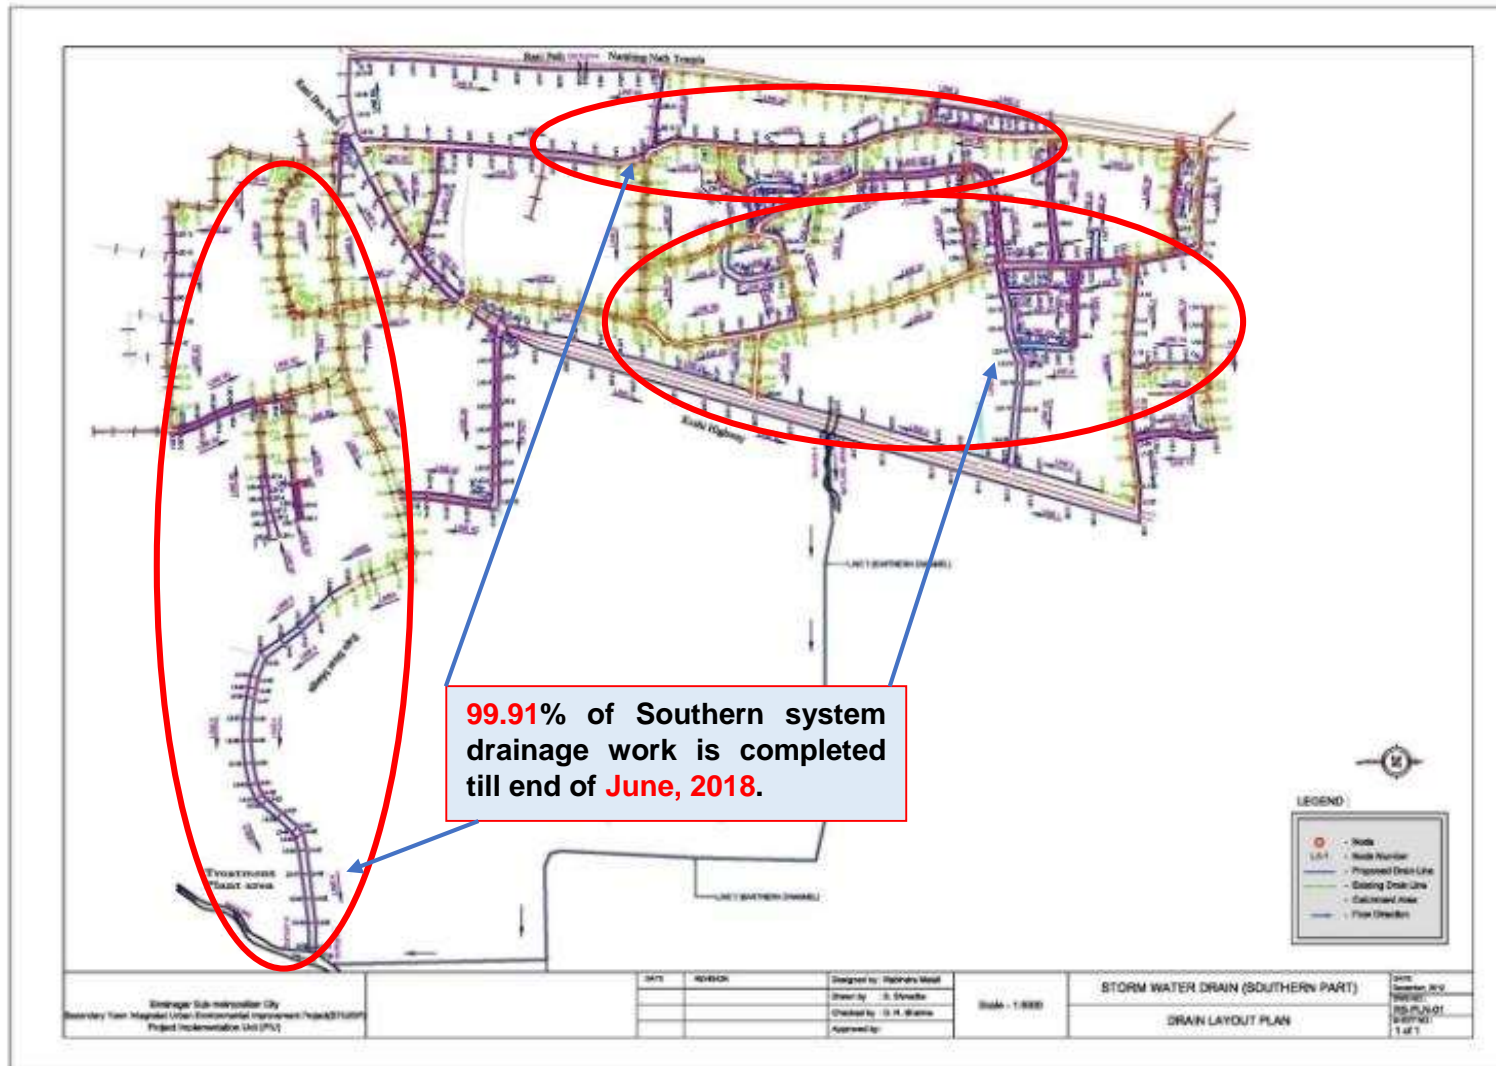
PROPOSED STORM WATER DRAINS IN BMC (Southern Drainage System)
